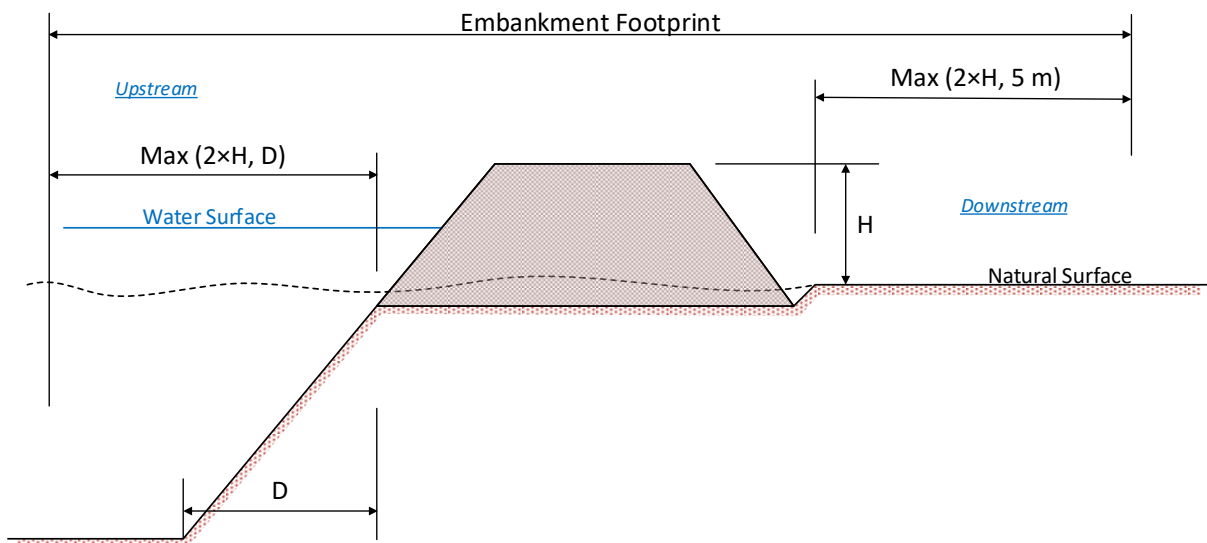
Extent of embankment footprint for a typical cut/fill EBS
